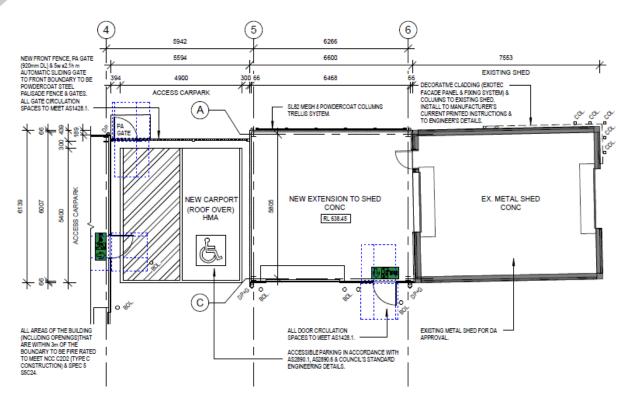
Proposed New Accessible Car Space, New Extension to the Existing Shed and the Existing Shed - TLA
